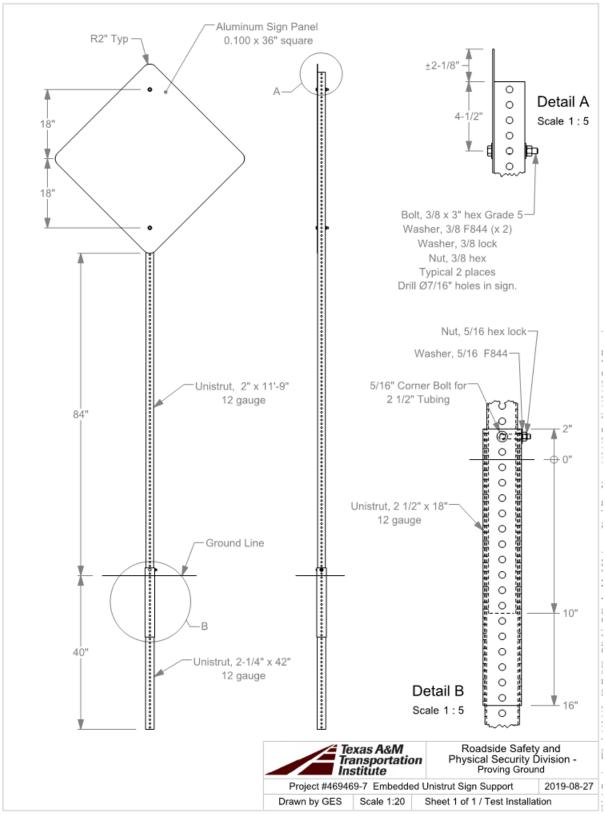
Overall Details of the PSST Sign Support in Anchor Stub System for Test No. 469469-7-5.
